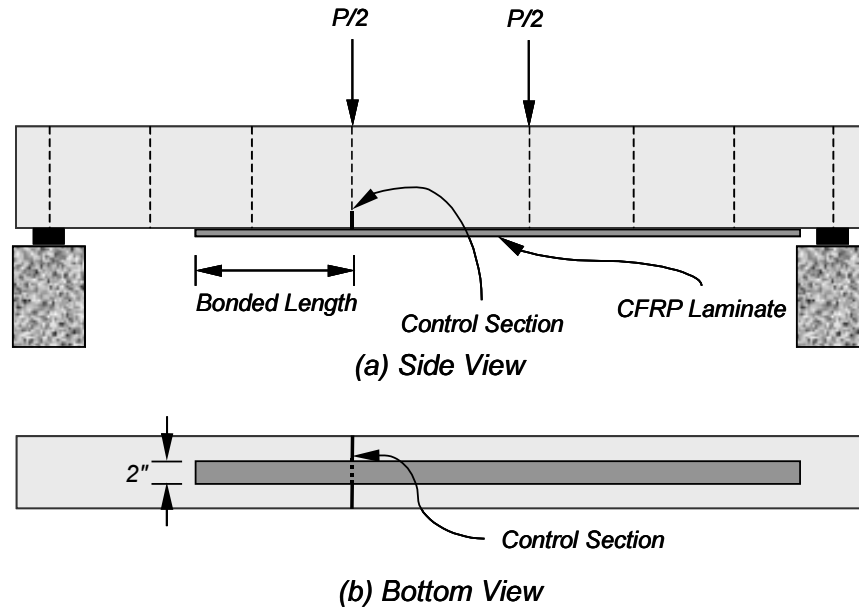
Schematic of Specimen with CFRP Bonded to Tension Face
